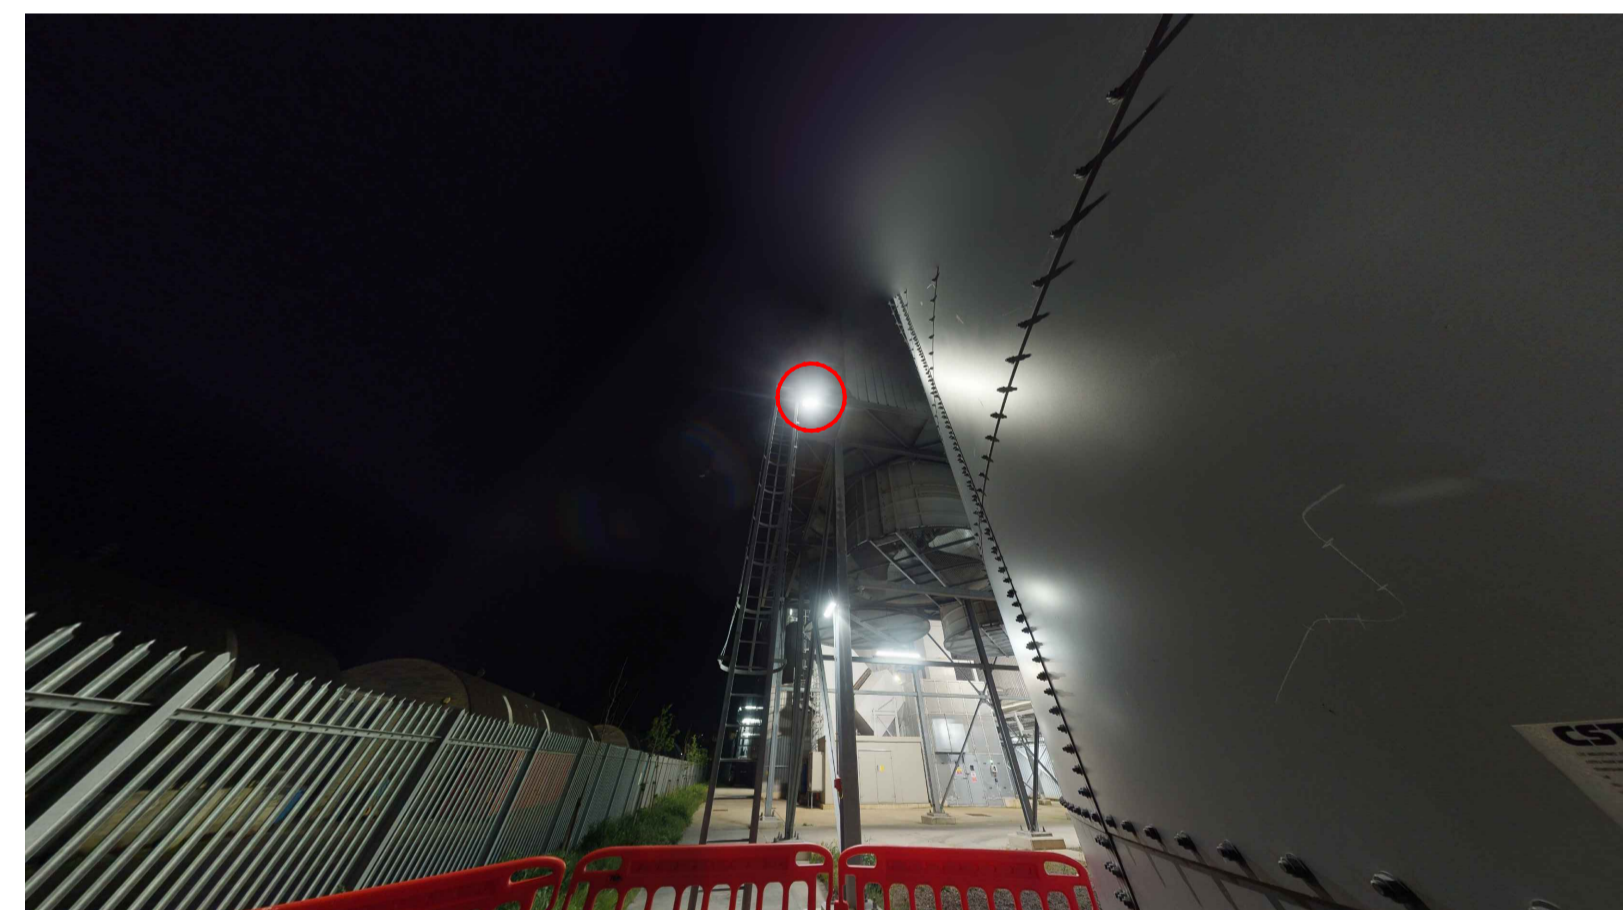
showing floodlight (circled) mounted at floor level of first floor
